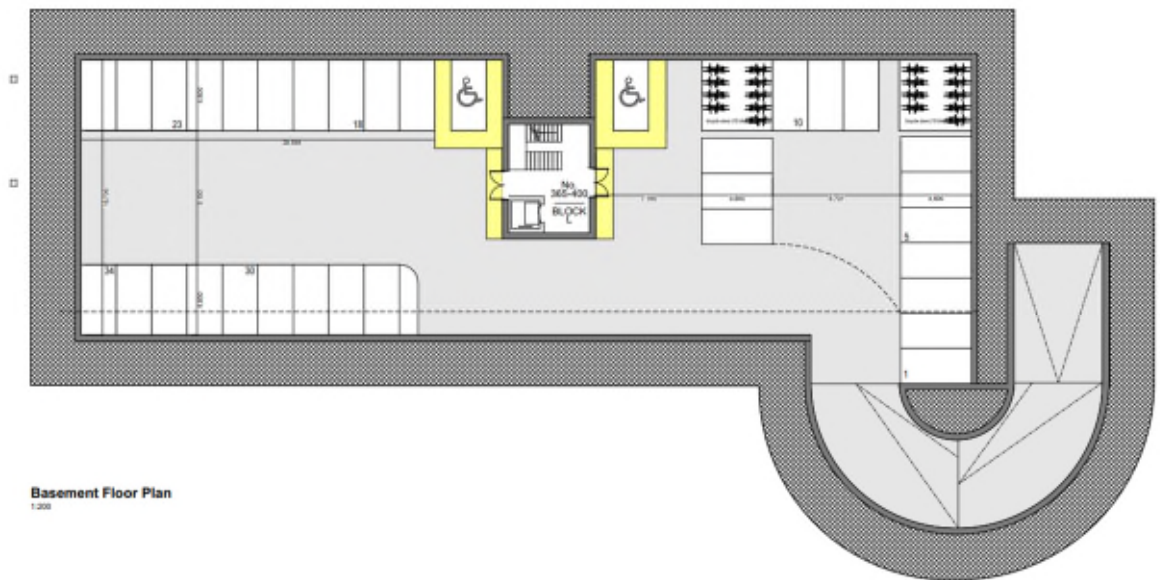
Proposed Basement Car Parking Layout (Delphi Architects drawing no. D1408-19-PA03)
